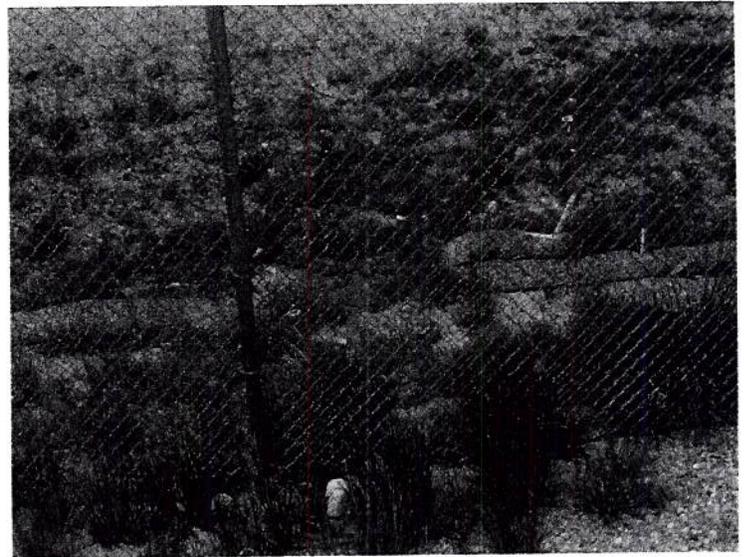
Erosion straw wattles along the western side of the construction boundary are not installed correctly as there are gaps between the wattles and the wattles are not properly staked.
